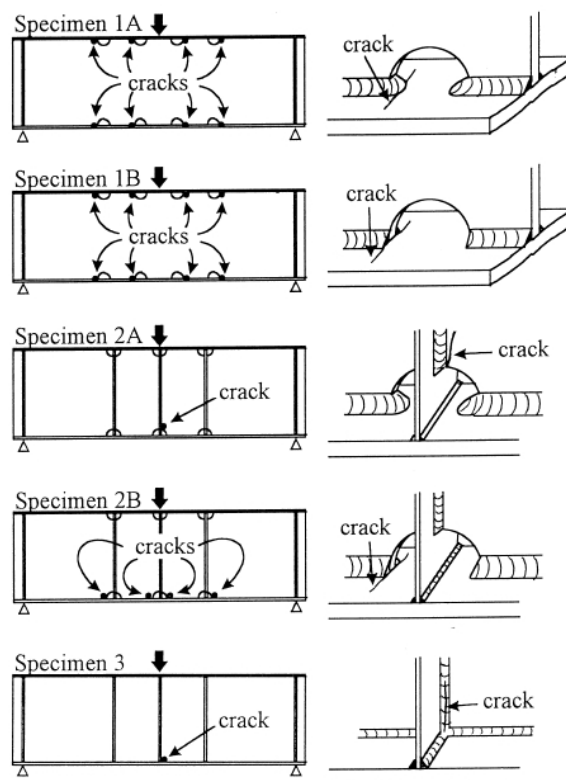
Load, crack, and weld condition of stiffener-plate specimens.[31]
